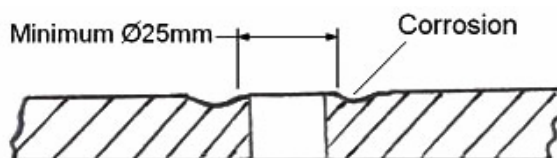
Corrosion Around Fixing Holes in Bearer Plate
